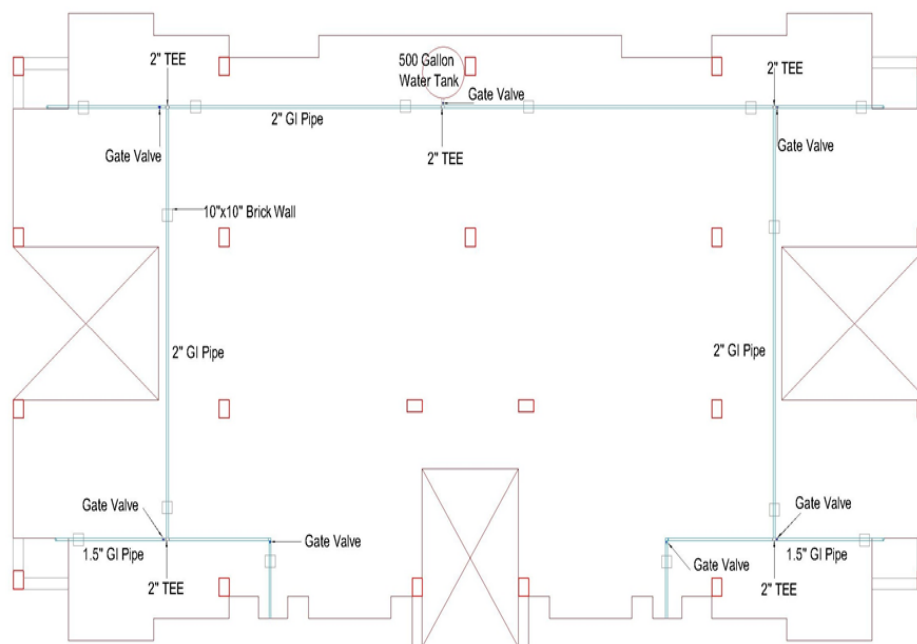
Implementation of grey water treatment system for a 5-storied residential building (Roof slab plan)
